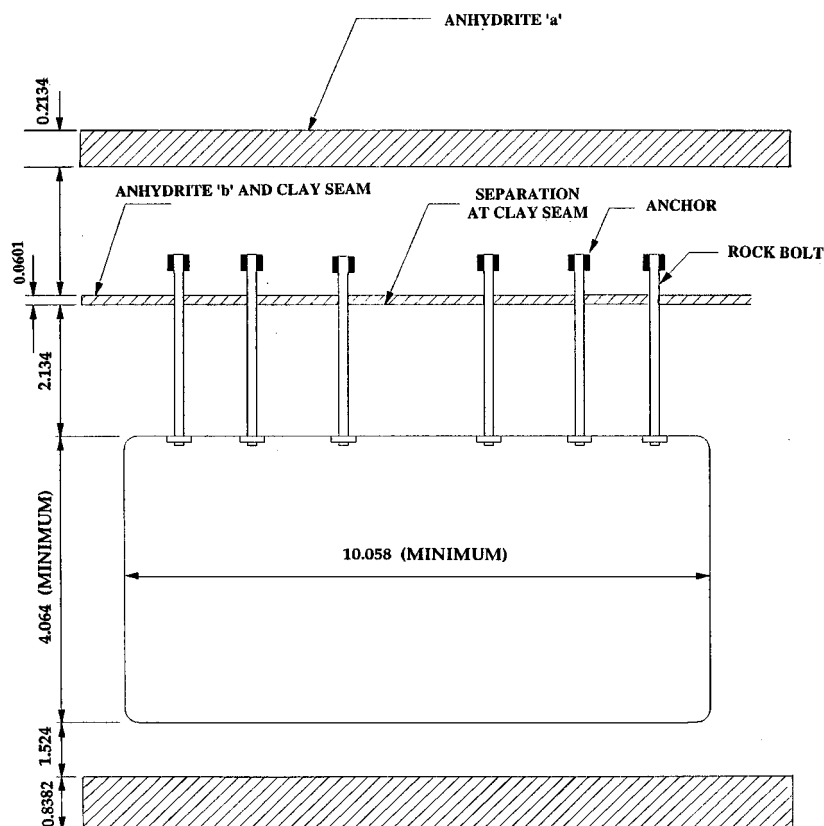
Application of rock bolts to support roof beam (all dimensions in m)
